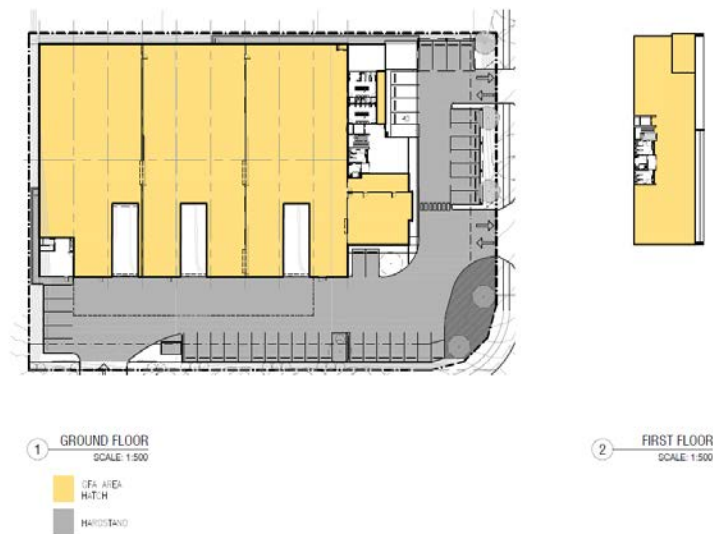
Proposed Office Floor Plan (GDP file, 2022)
